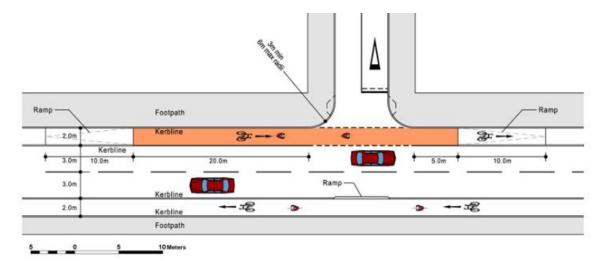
NCM: Side Road Joining Street with Cycle Track
